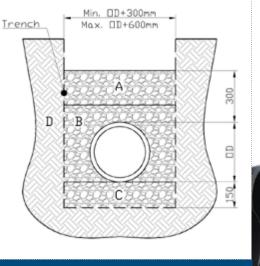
TYPICAL INSTALLATION DETAILS
